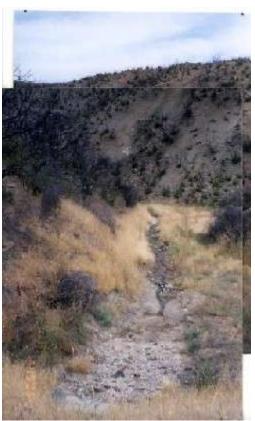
Area upstream of a 36 inch culvert had unstable slopes. An end section was added to the culvert inlet to pass debris.
